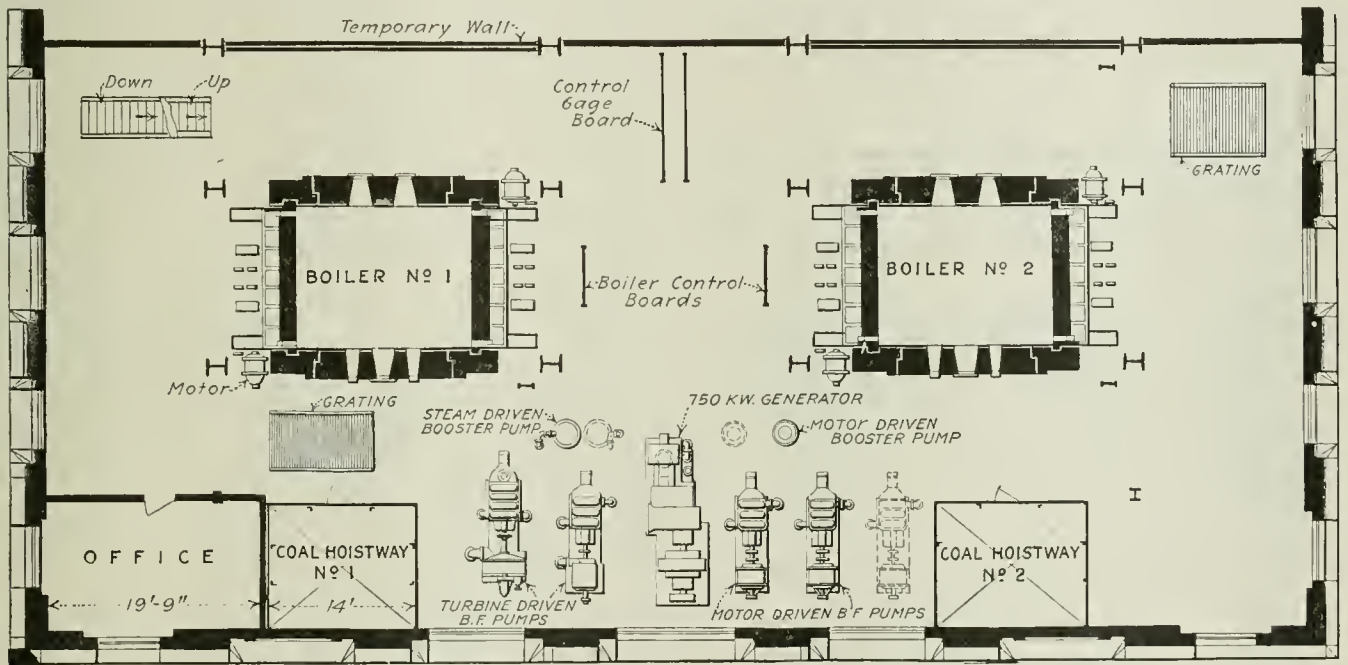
PLAN OF PRESENT SECTION OF CONGRESS STREET STATION
